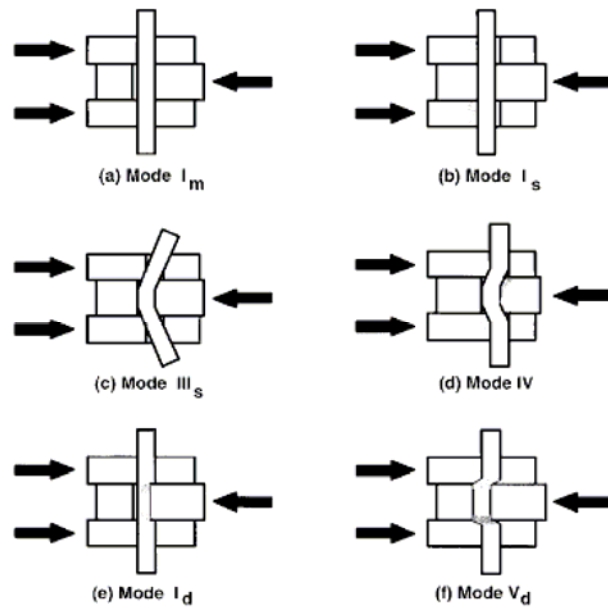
Wooden peg failure mechanisms from Sandberg et al. (2000)
